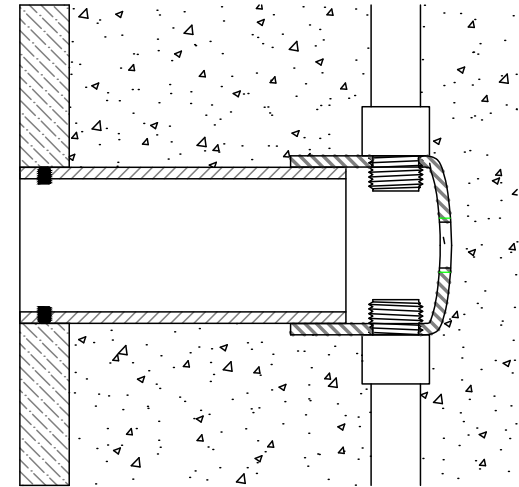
SURFACE FINISH MATERIAL BETWEEN 1" AND 2-1/2" THICK
